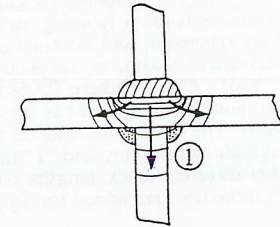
A surface crack propagation from weld toe to flange and web plates.
